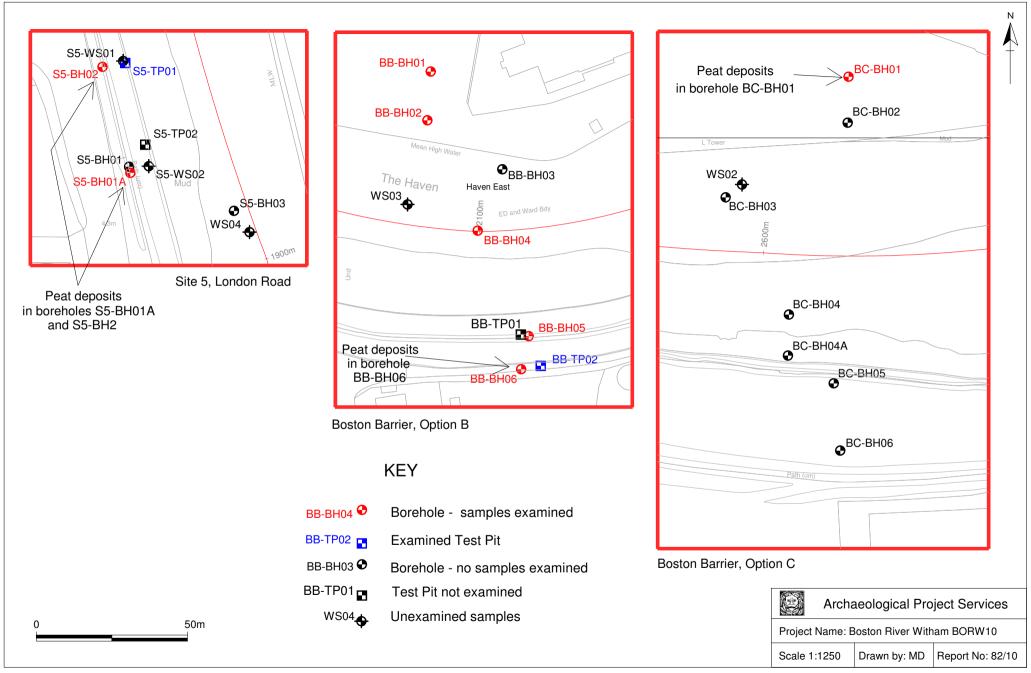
Detailed plans showing locations of examined bore columns samples and test pits
